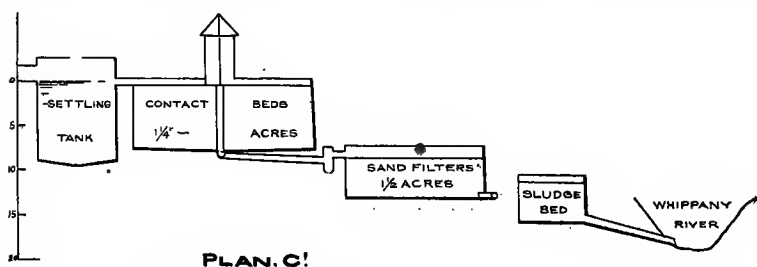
FIG. I. Ideal section showing profile through disposal plant, Plan C', with relative elevations.
